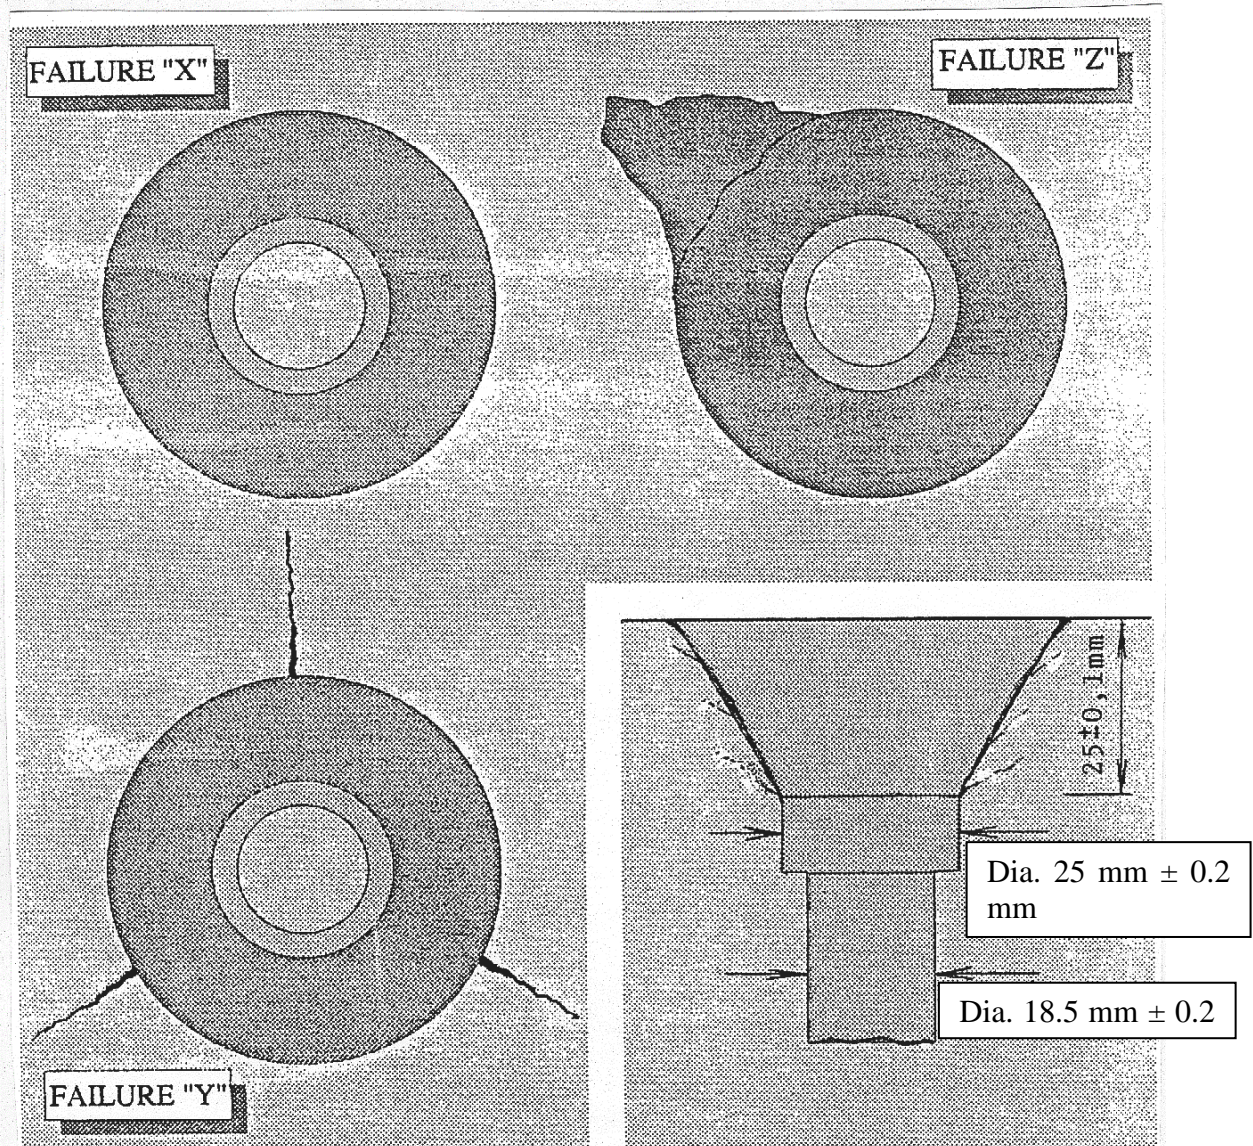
Possible Capo-Test failures. Only failure type “X” is acceptable.
